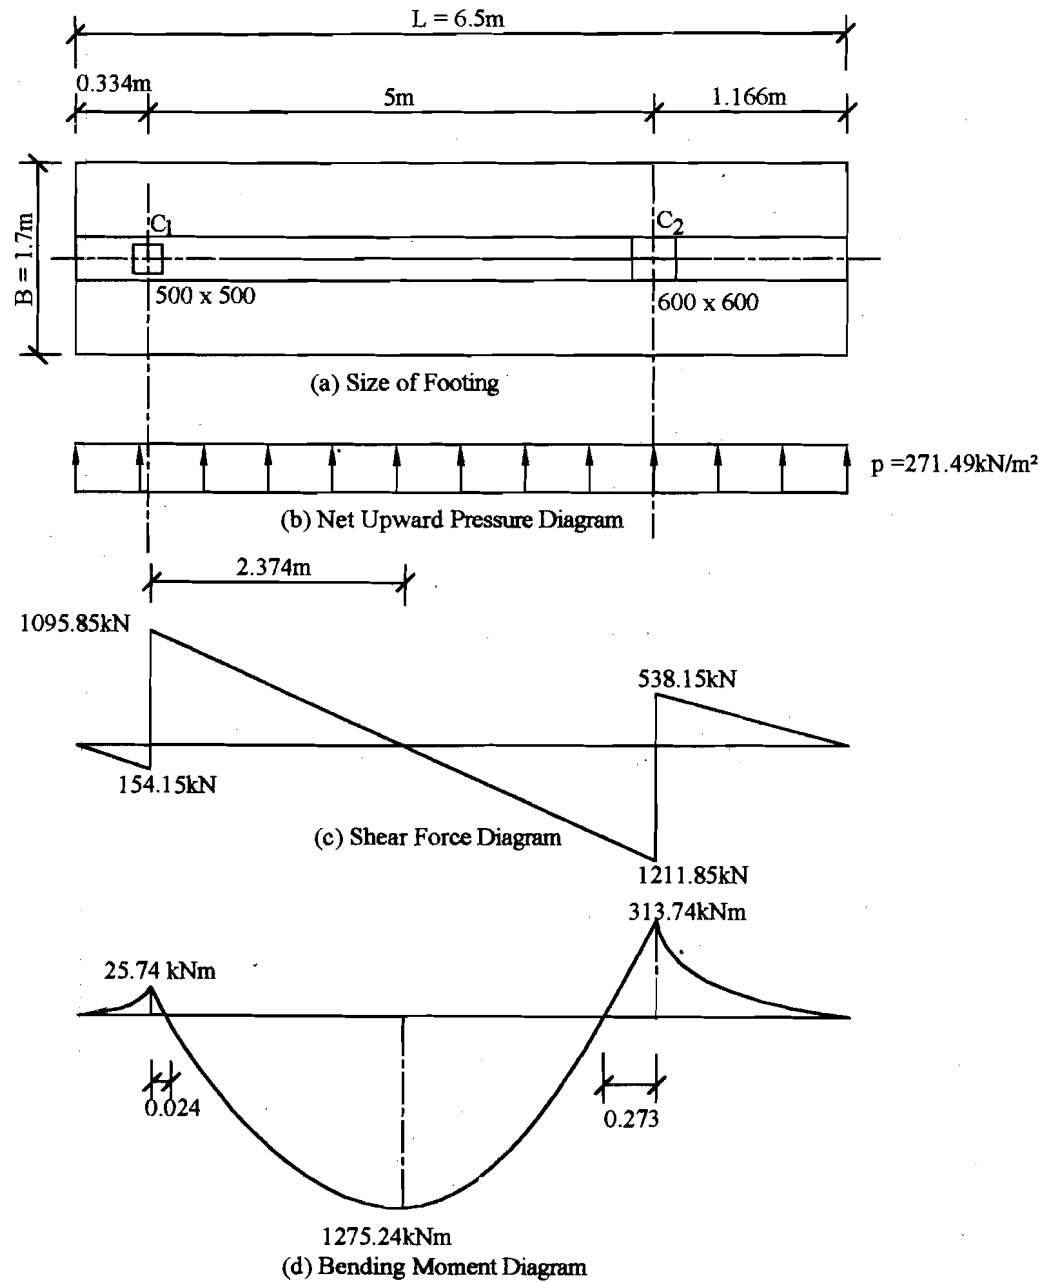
Size of Footing, S.F.D. & B.M.D.
